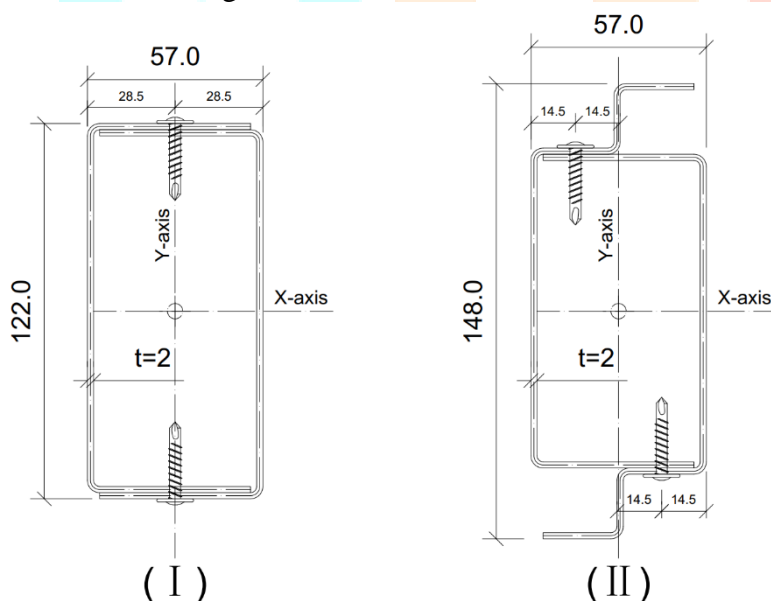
Built-up CFS sections: (left) used in Beams 1 & 2; (right) used in Beam 3.
